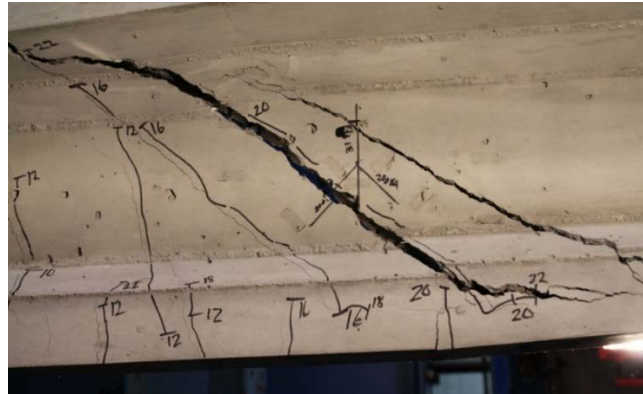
Shear Failure of Specimen 2 with Minimum C-Grid Reinforcement
